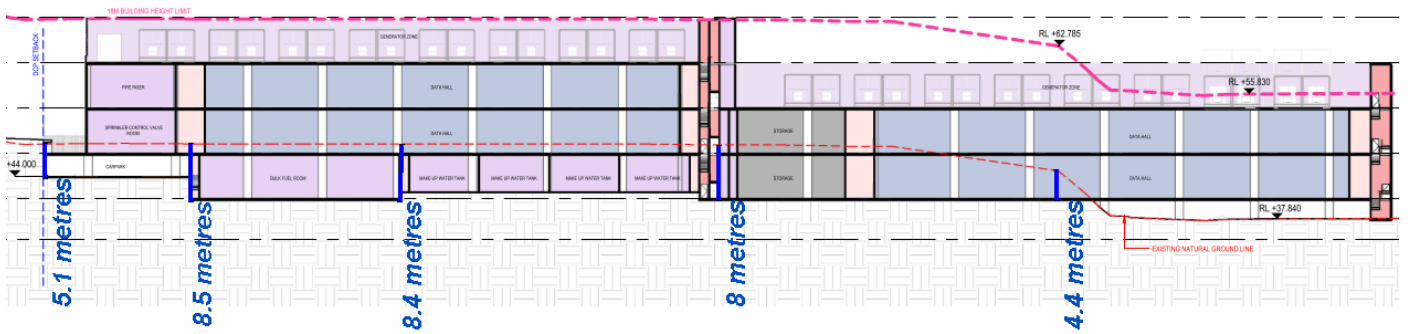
Section through the site with existing ground level in dashed red and levels of excavation depicted in blue (Source: Architectural Plans)
